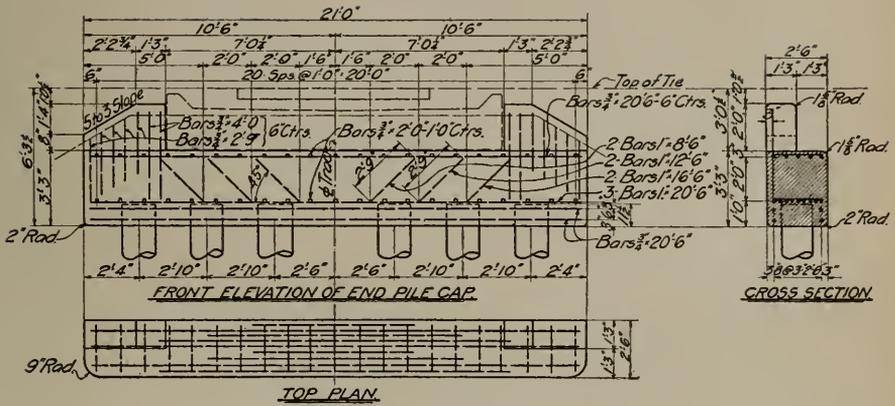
STANDARD CONCRETE PILE TREXSTLE—CHICAGO, BURLINGTON & QUINCY RAILROAD.
